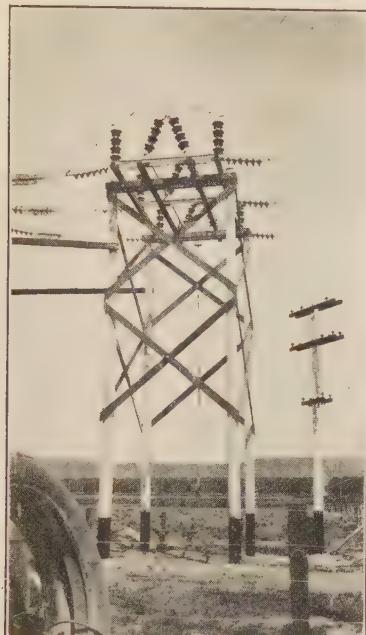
FOUR-POLE STRUCTURE FOR MOUNTING HEAVY TYPE SECTIONALIZING SWITCH
